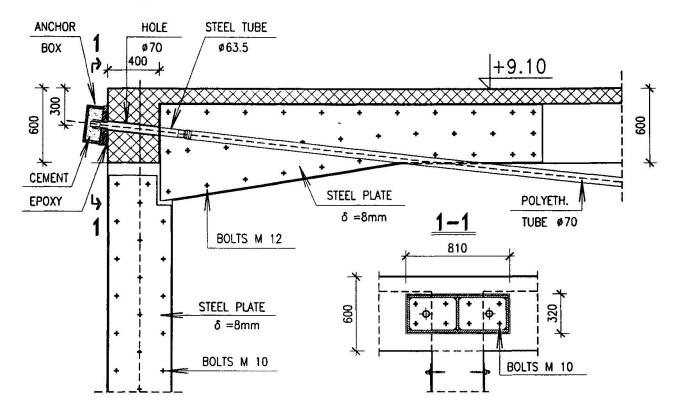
Detail 'C' of tendon anchoring and lateral strengthening with steel sheets
